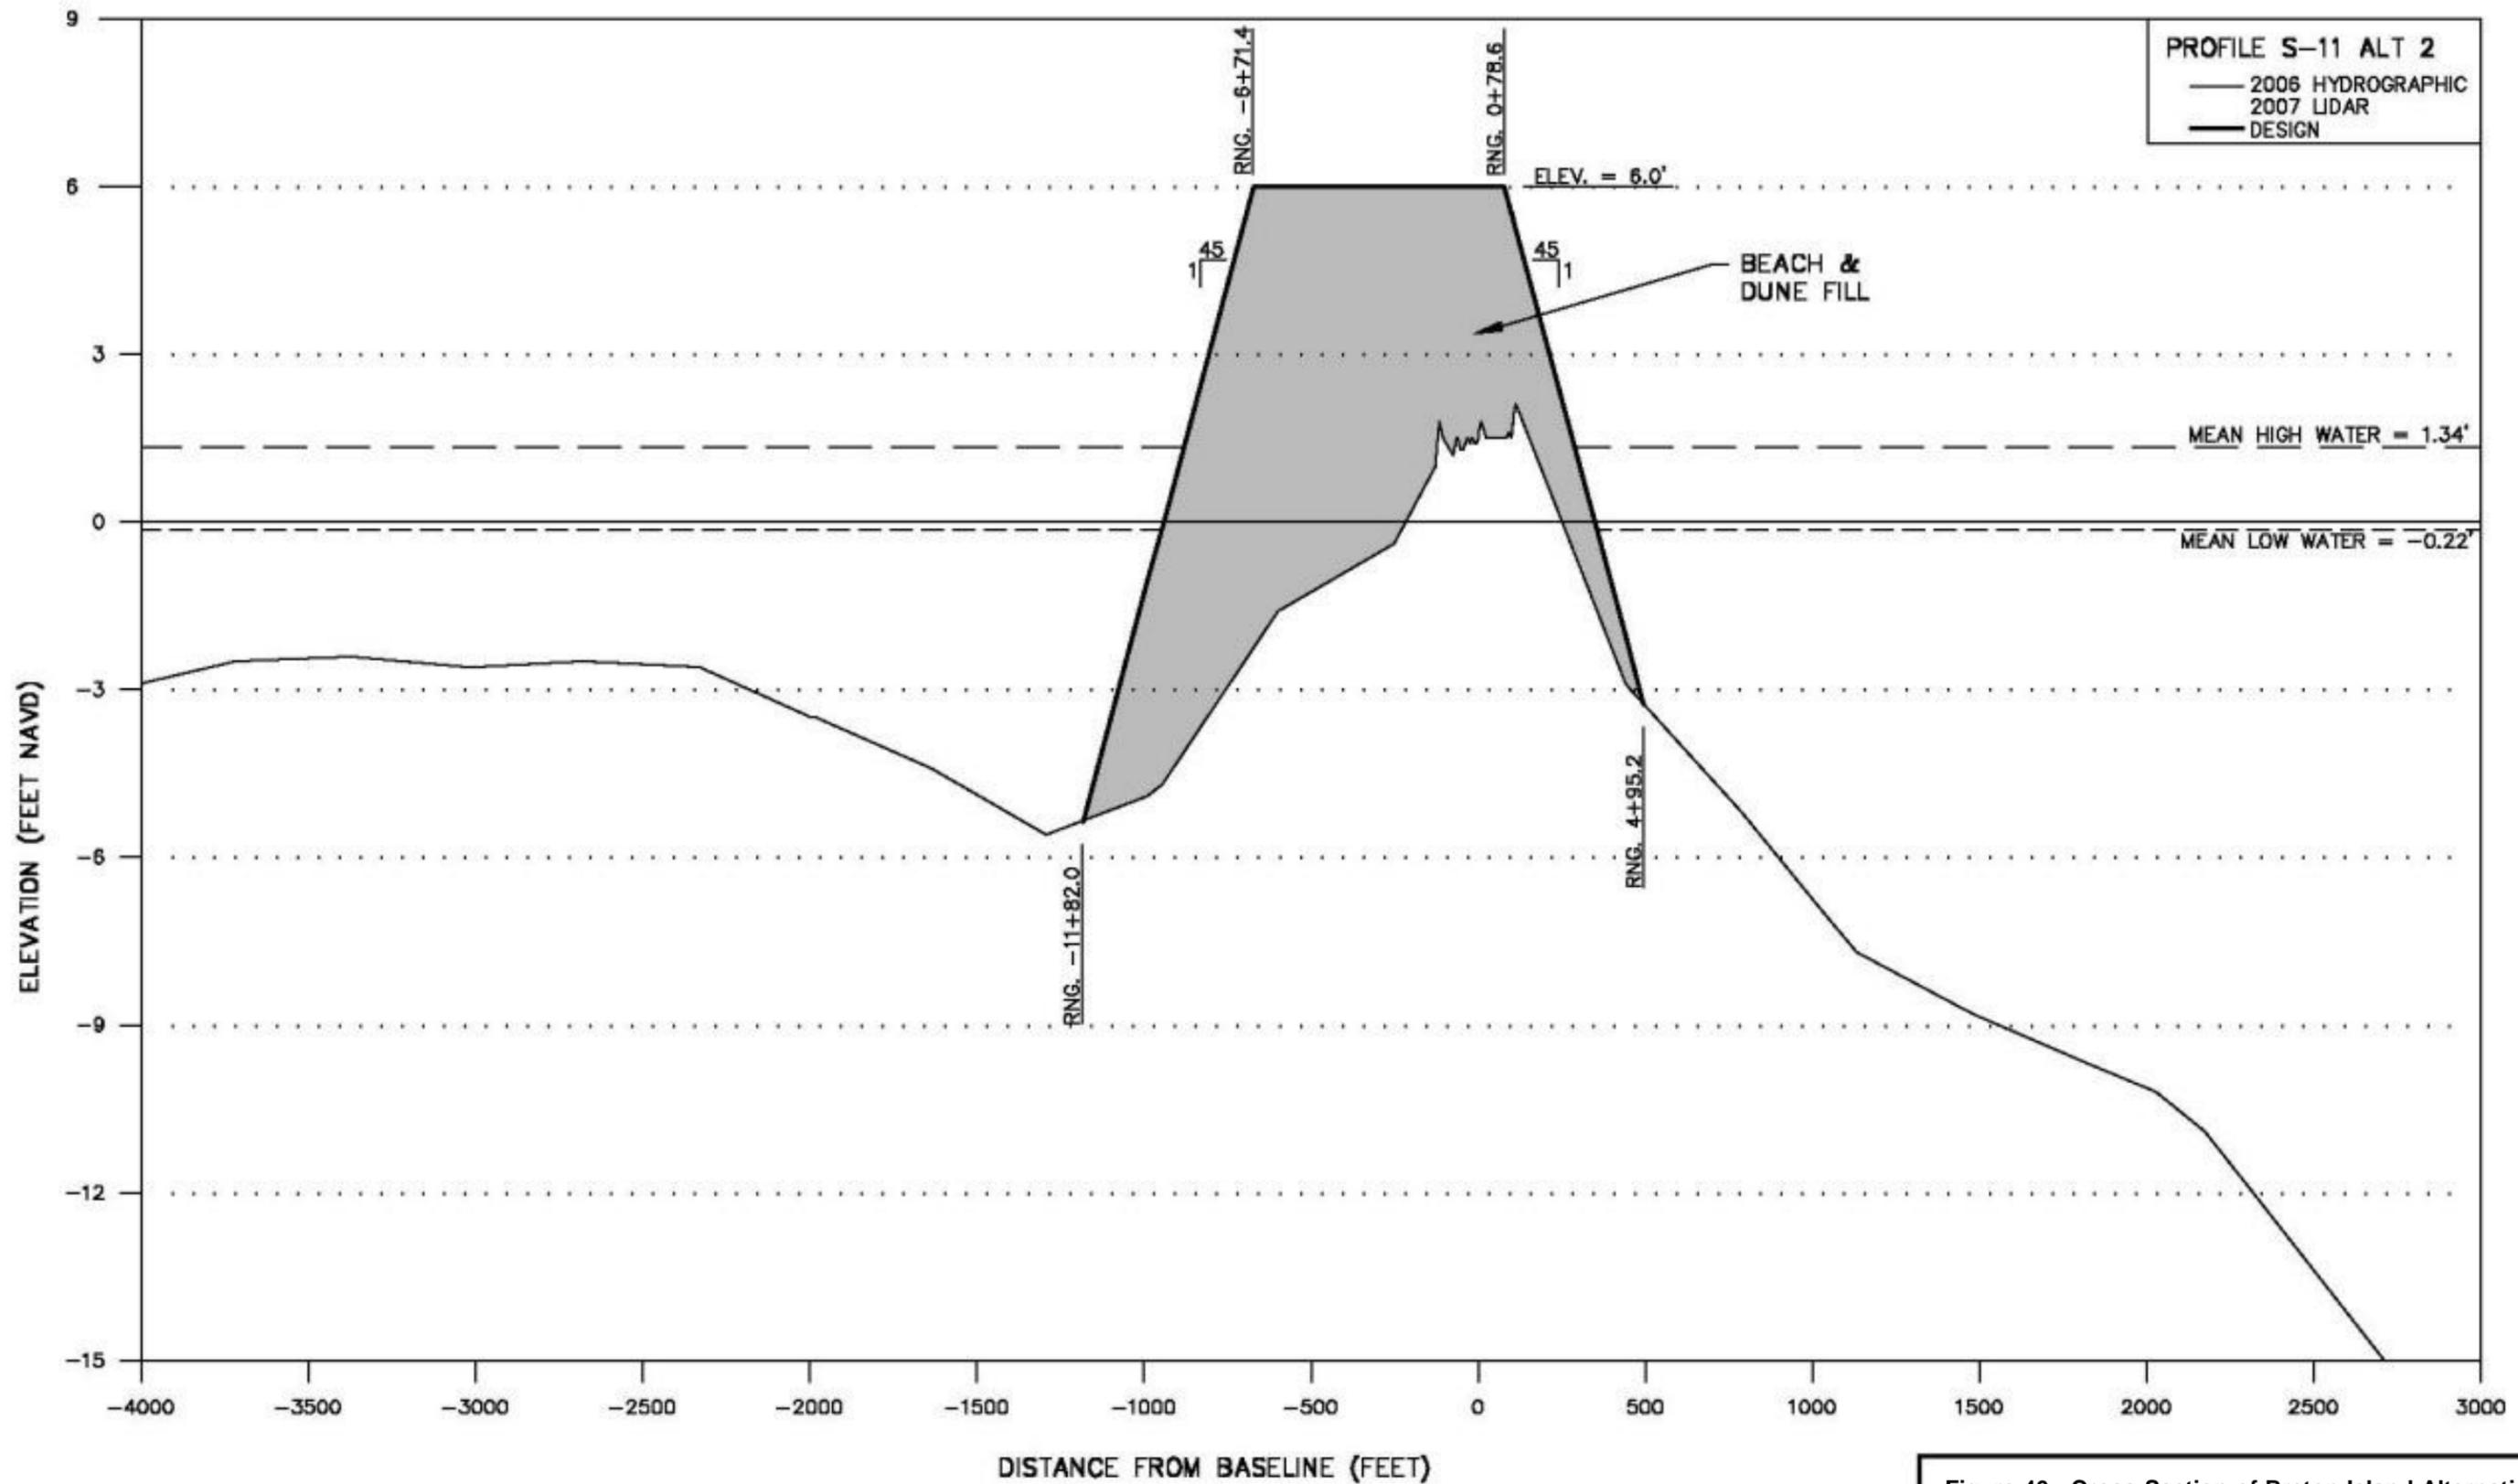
Cross-Section of Breton Island Alternatives 2 and 4
